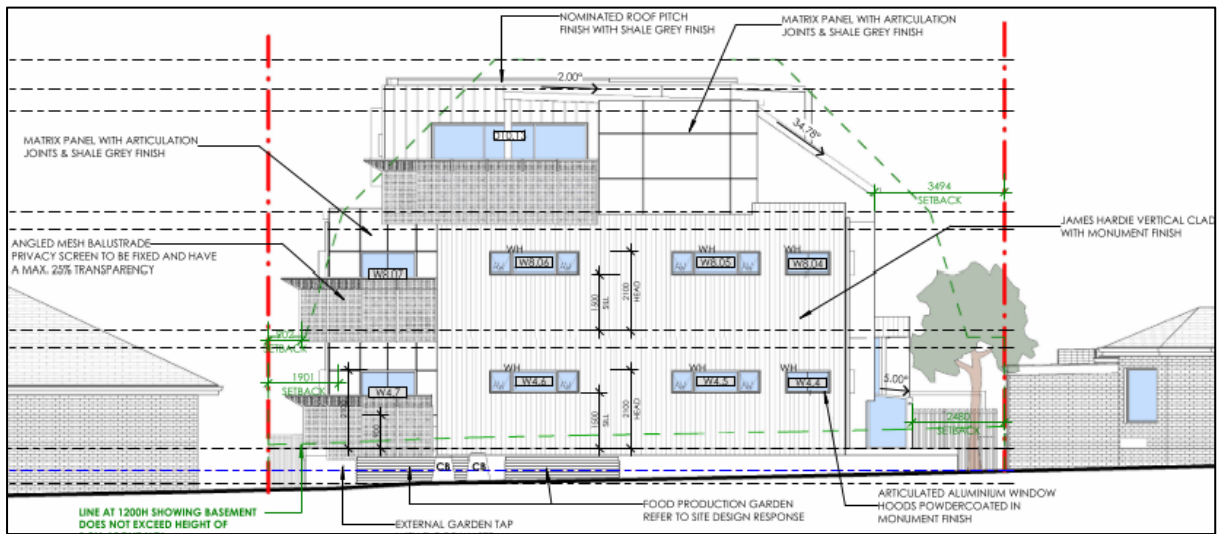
(Above): Northwest elevation showing presentation to the rear adjoining land at 13 and 15 Ferndale Parade. Source: Application documents.
